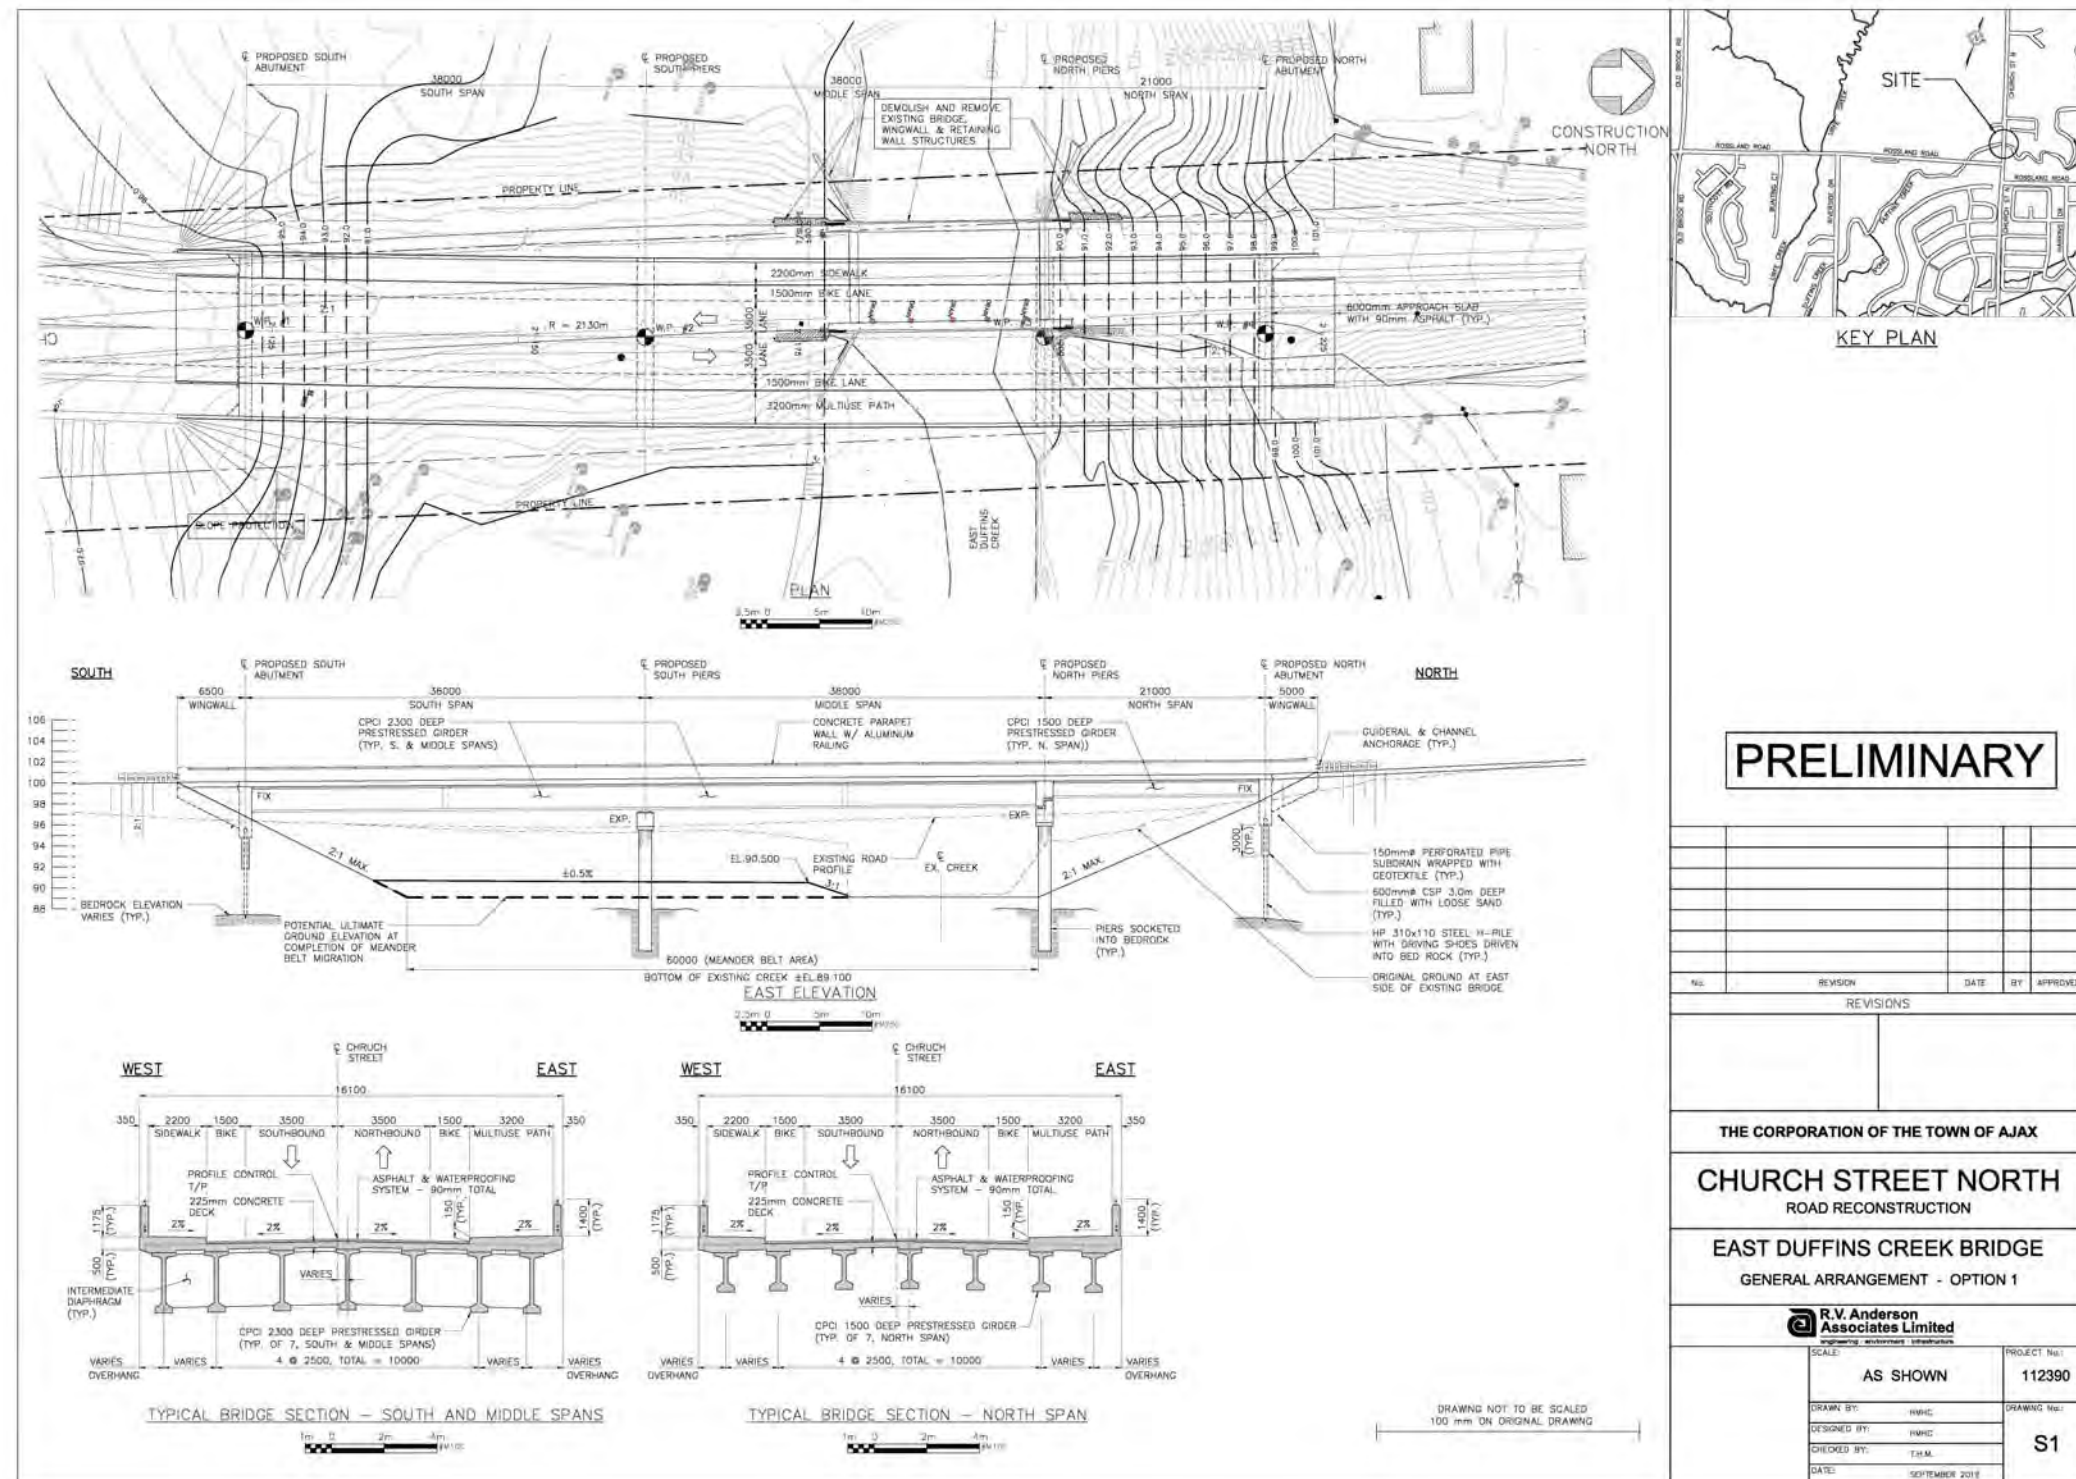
Preliminary General Arrangement – Three Span Bridge
